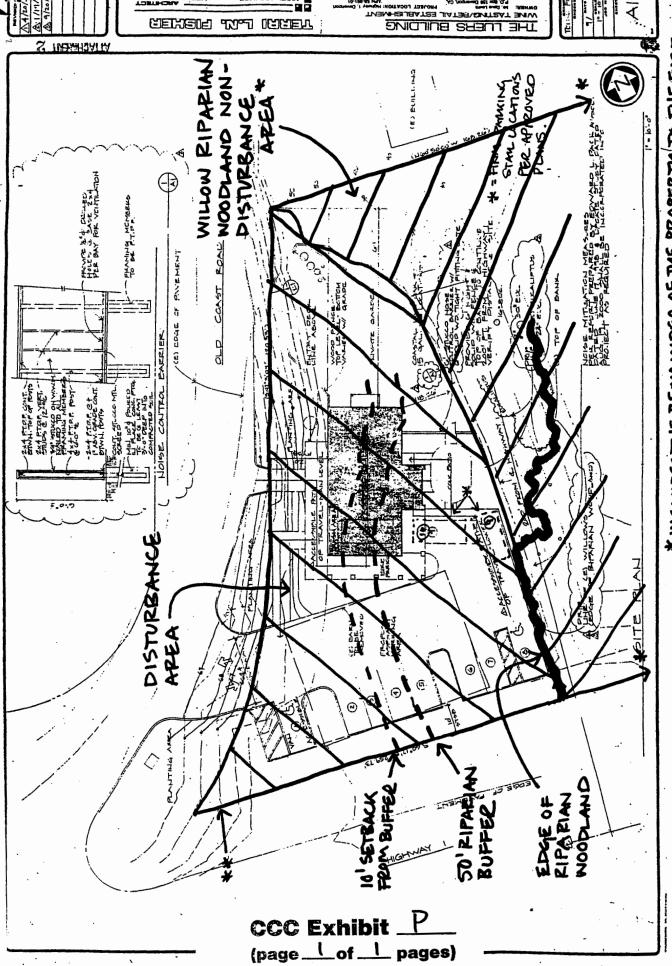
The Luers Building Project Site Location. Bryan Mori Biological Consulting Services.
